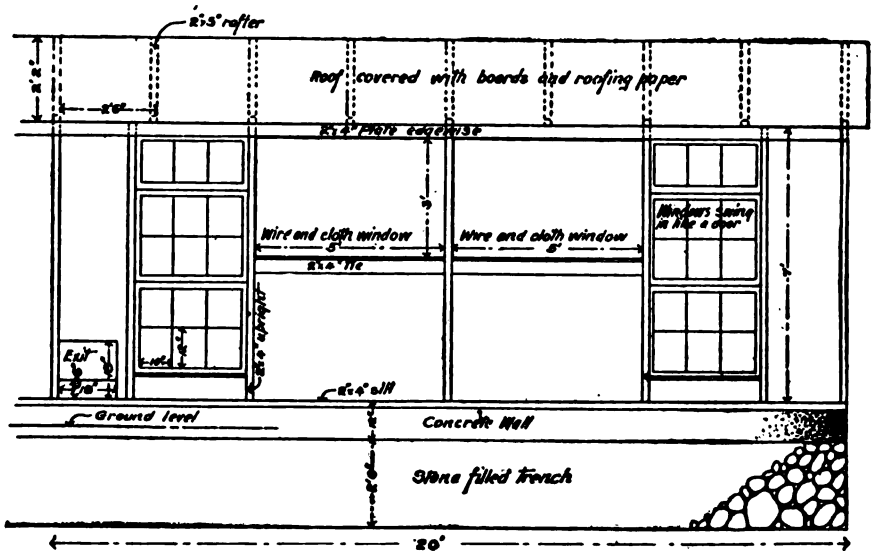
Front elevation of a Cornell poultry house with pens 20 feet square, adapted to the combination roof
